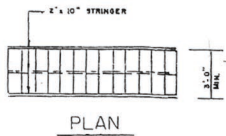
SHEET FOUNDATION CONSTRUCTION
